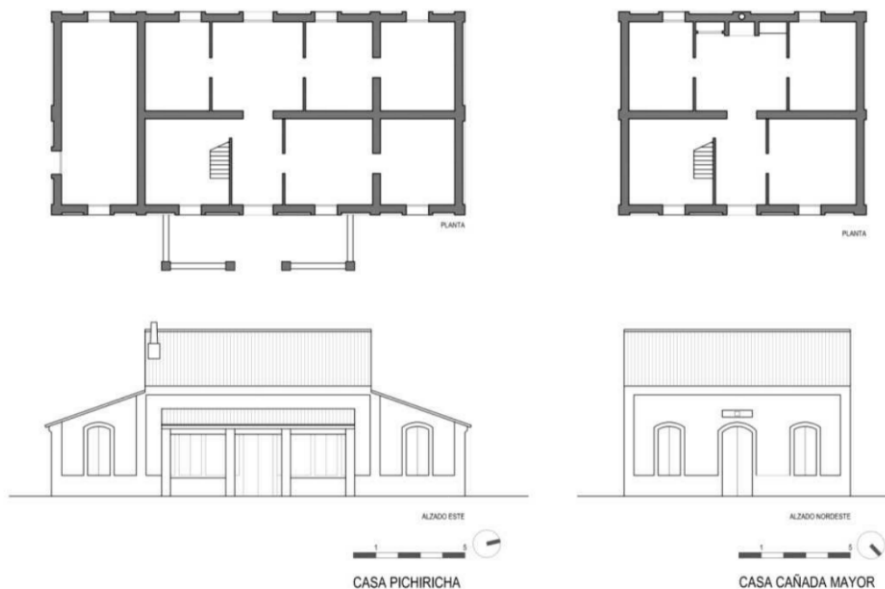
Pichiricha House and Cañada Mayor House. Floor plans and elevations
